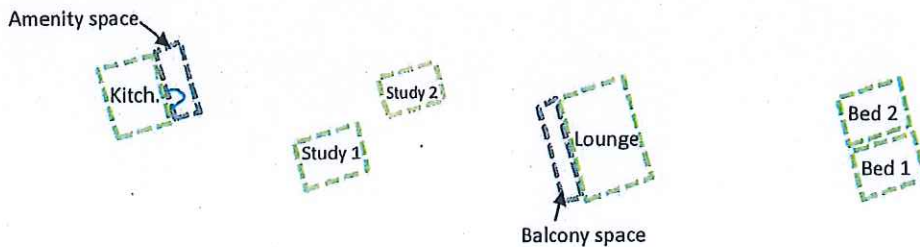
Plans of key rooms in 23 Balcombe Street (Lower Ground, Ground, First, Second respectively)
